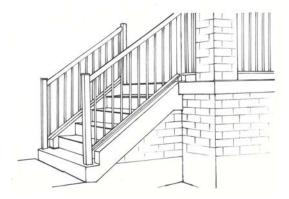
Steps should have masonry veneer on sides where more than 3 precast steps are necessary (front or flanking elevations only)
